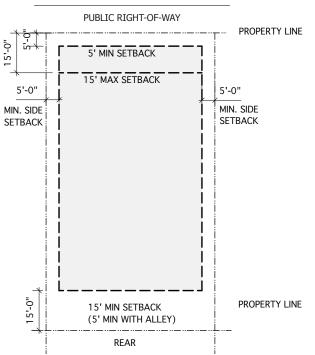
SU-2/VTSL BUILDING PLACEMENT DIAGRAM
